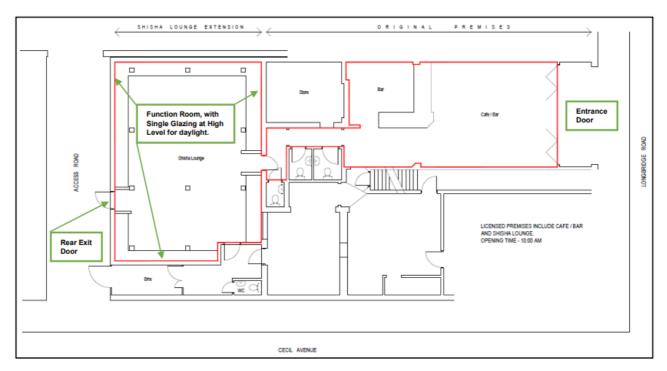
Application Site Floor Plan Depicting Function Room with Glazing at High Level
